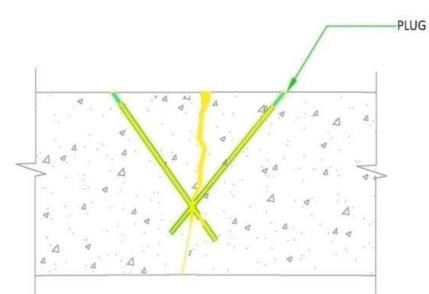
Removal of Surface Sealer and Installation Ports after the Resin Cures (54).
